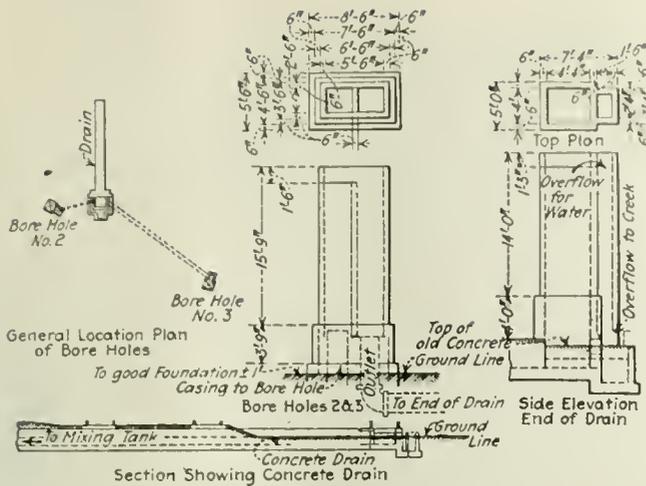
PLAN OF CONCRETE SETTLING TOWERS AND DRAIN FOR CRUDE MINE WATER
